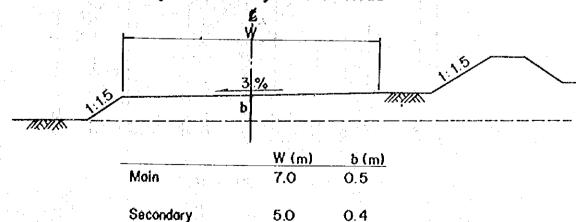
TYPICAL CROSS SECTION OF FARM ROAD
